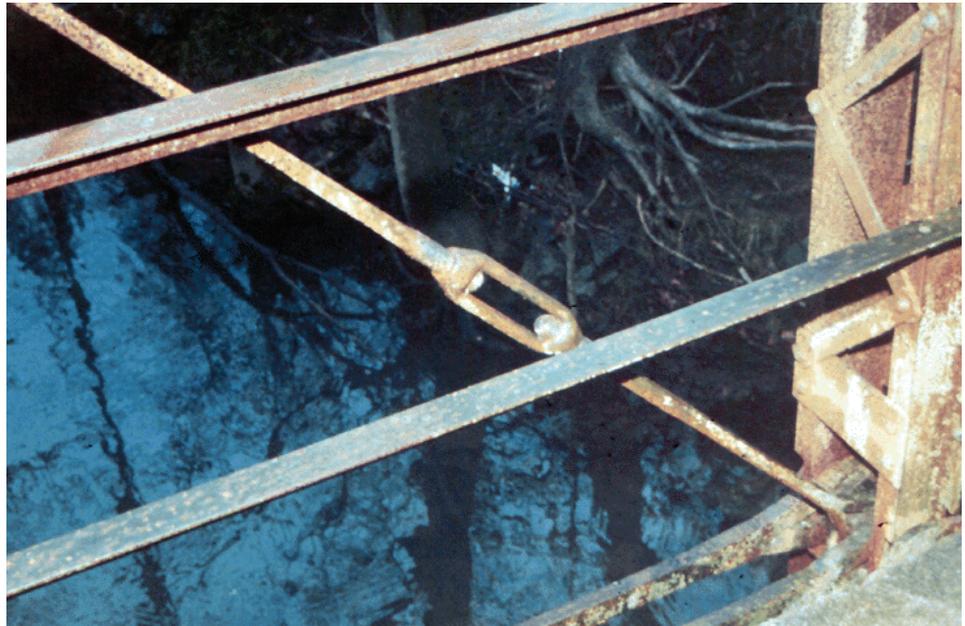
Turnbuckle on a Truss Diagonal
